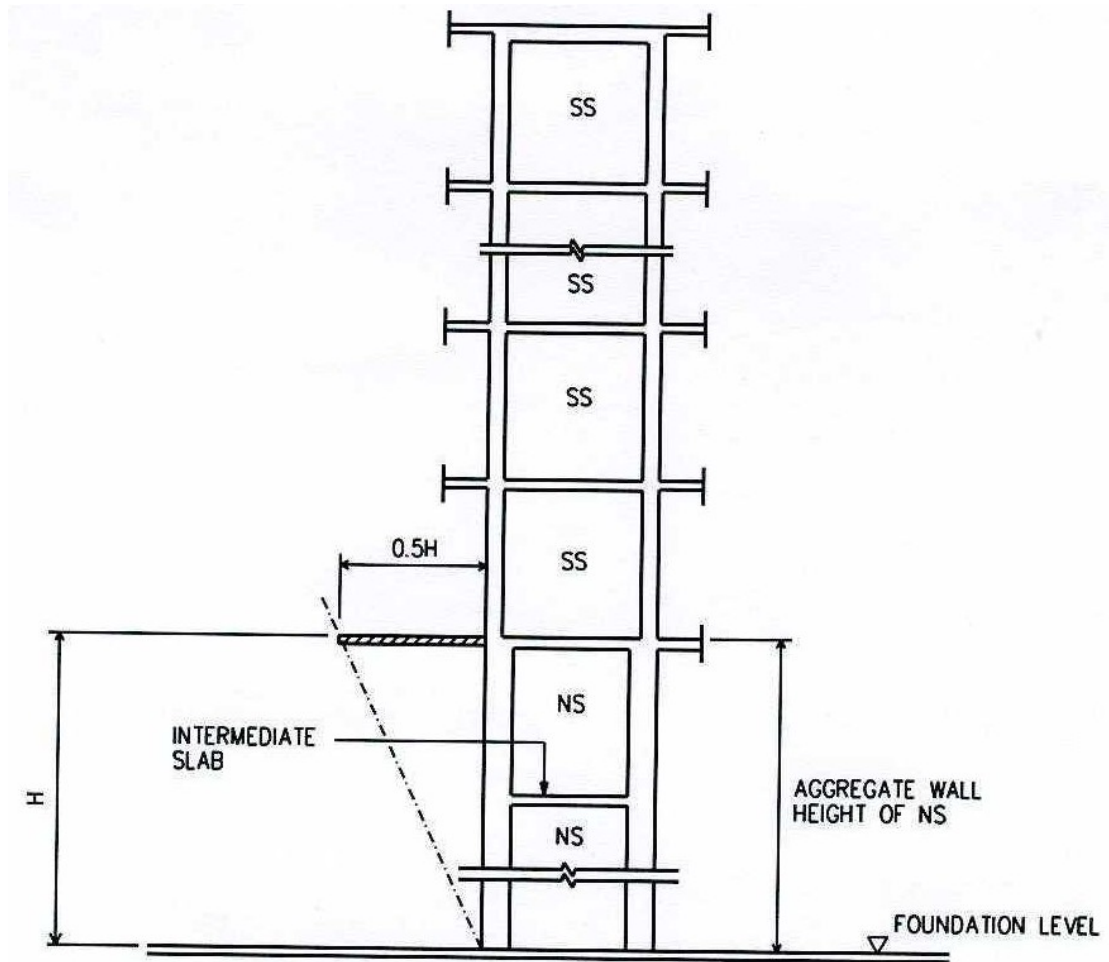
CROSS SECTION OF SS TOWER
